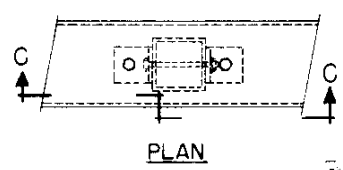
DETAIL OF END CONNECTION FOR FASTENING BRIDGE RAIL
